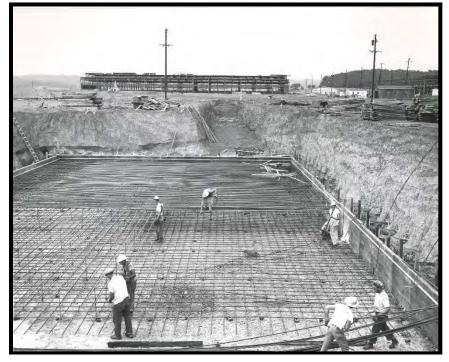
Foundation Construction of the X-330 Process Building, August 1953
